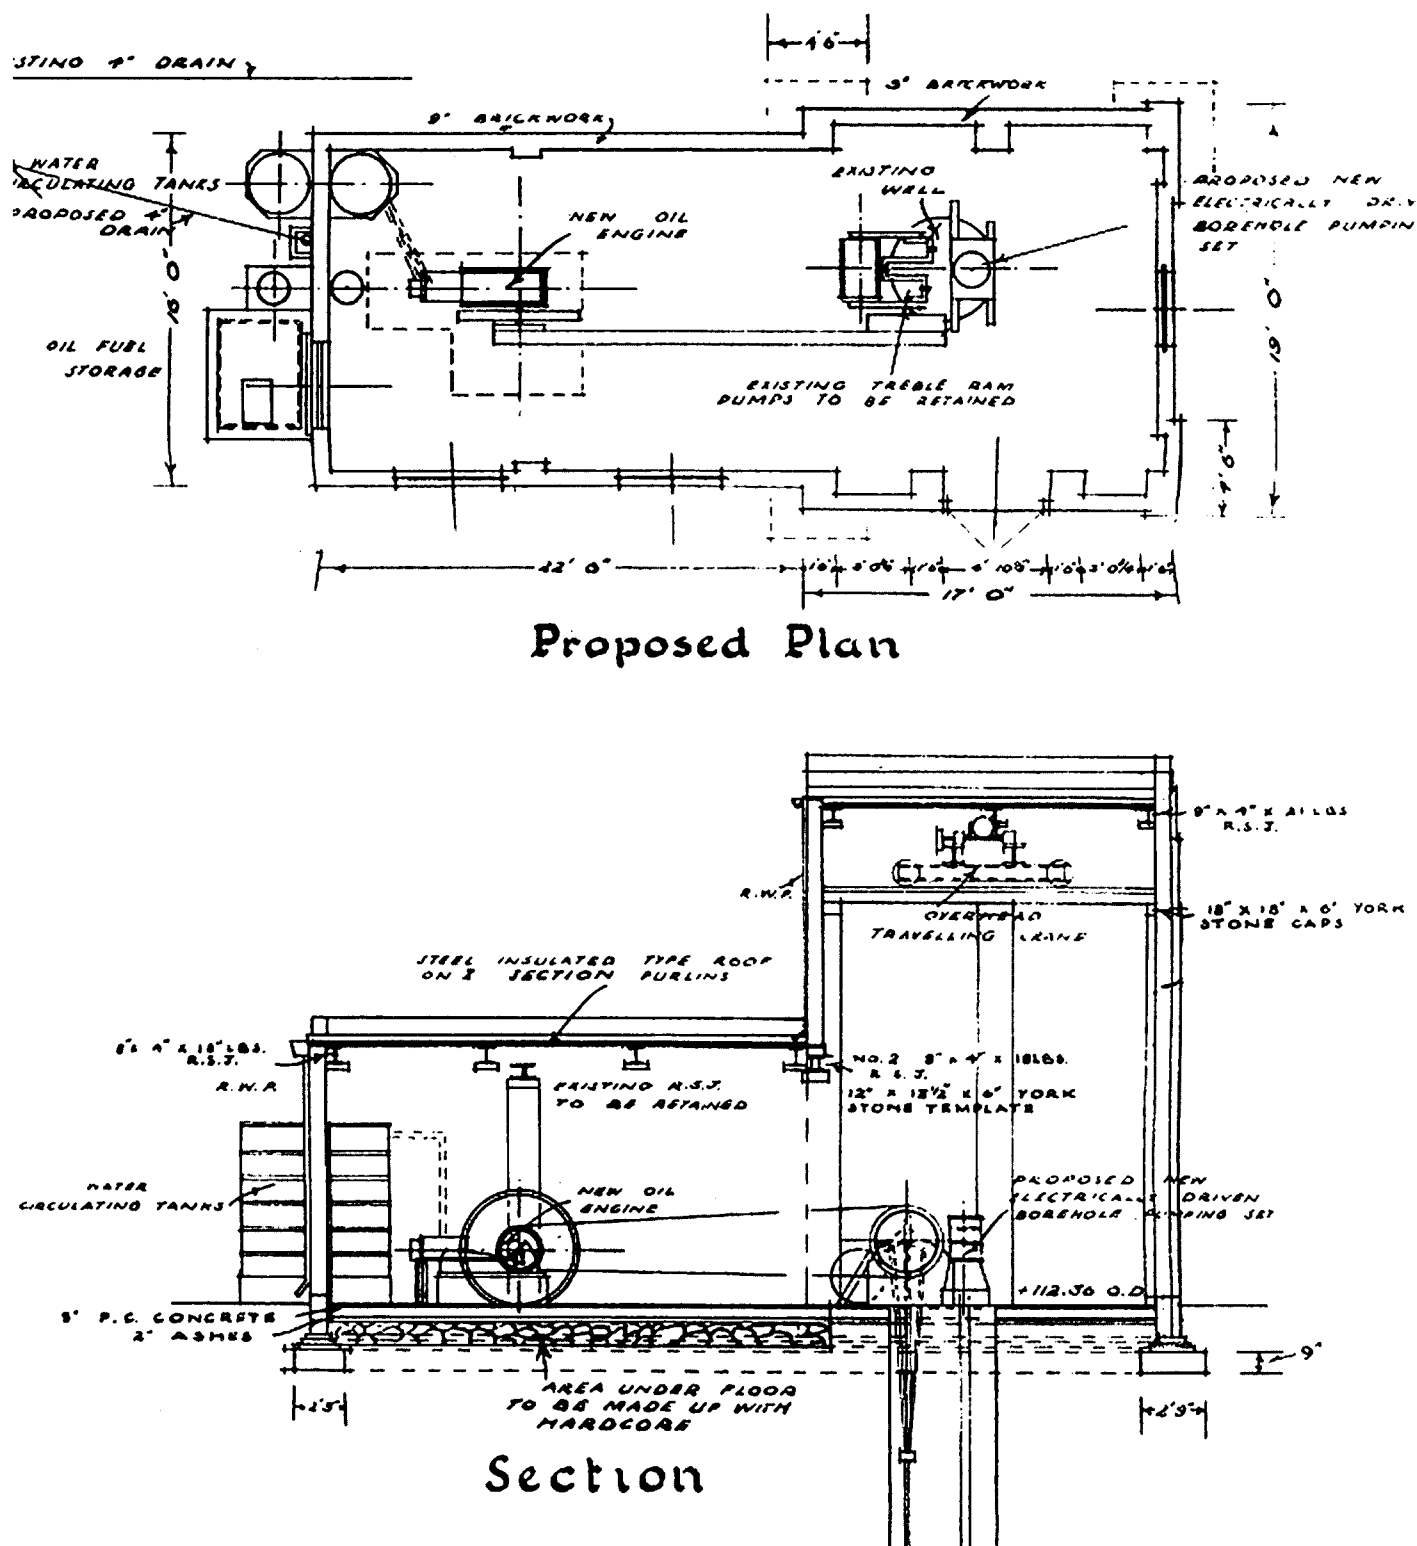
Plan and section of the new Spital Road pump house of 1937 (ERO D/B 3/14/31).
